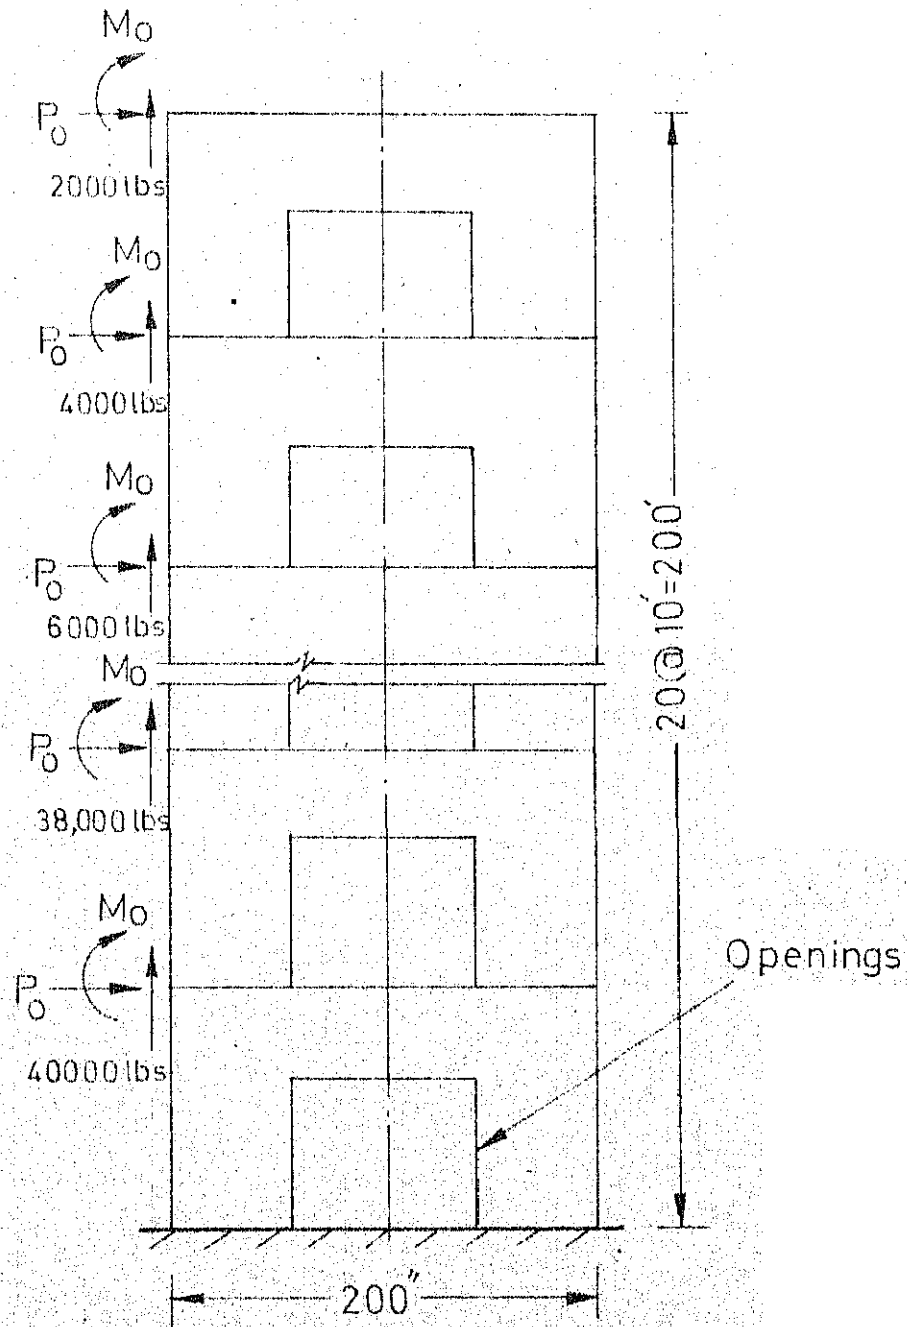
20 STOREY SHEAR WALL WITH OPENINGS
